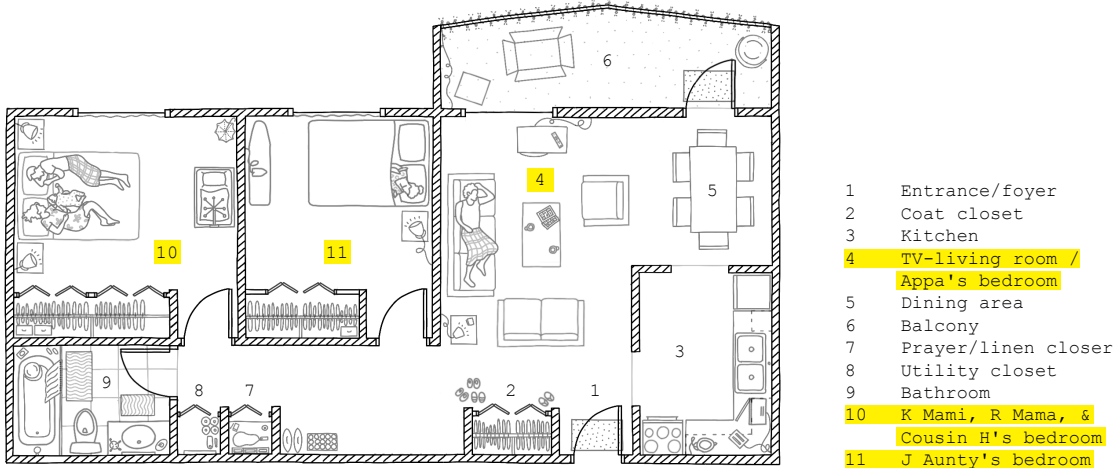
Floor plan sketch highlighting how rooms were occupied from 1988-89 in the upper-storey, west-facing St. James Town apartment.
